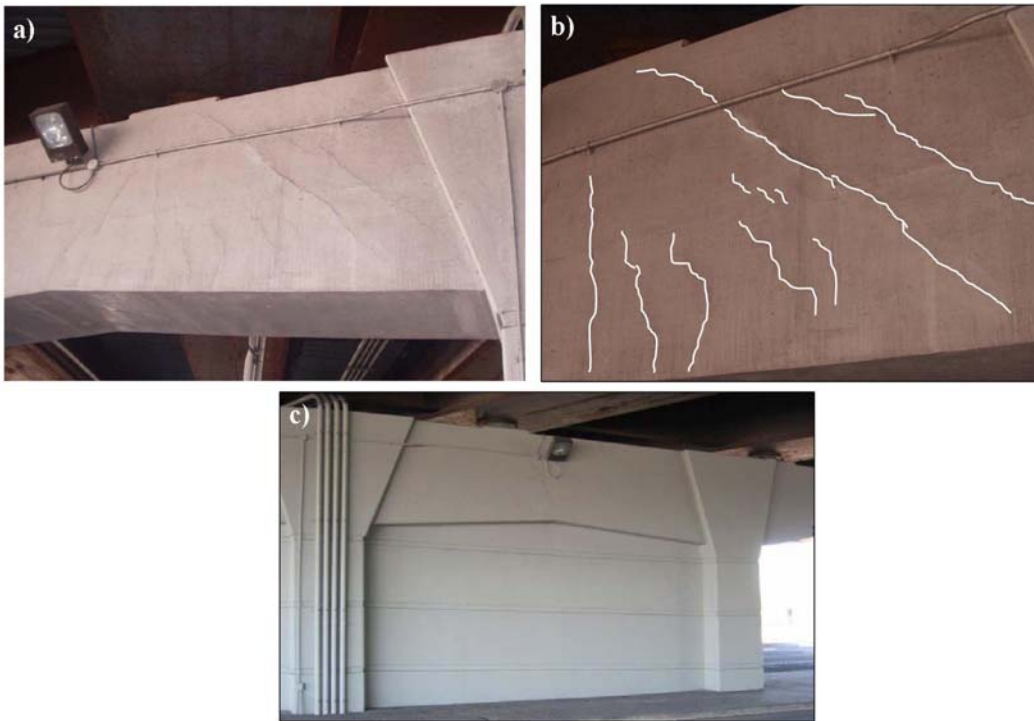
a) Typical cracking pattern; b) Highlighted diagonal shear cracks; c) Completed structural retrofit
